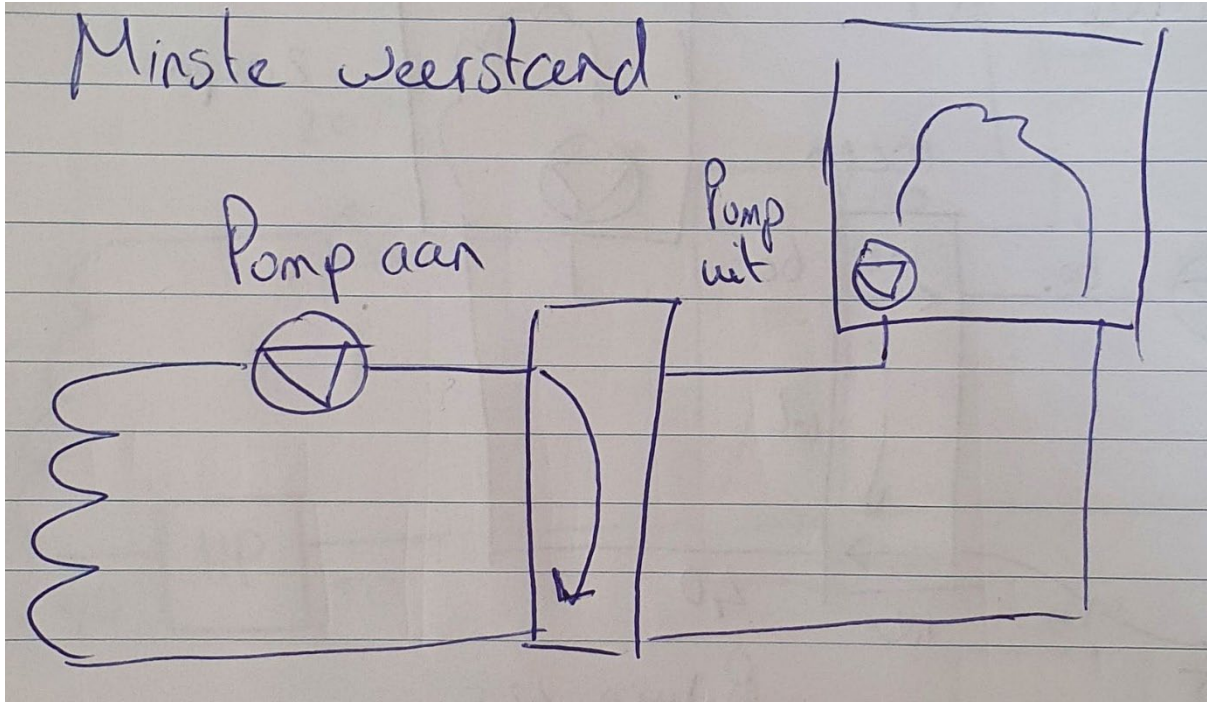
Gas boiler + hydraulic separator, gas boiler pump turned off (Own figure)
